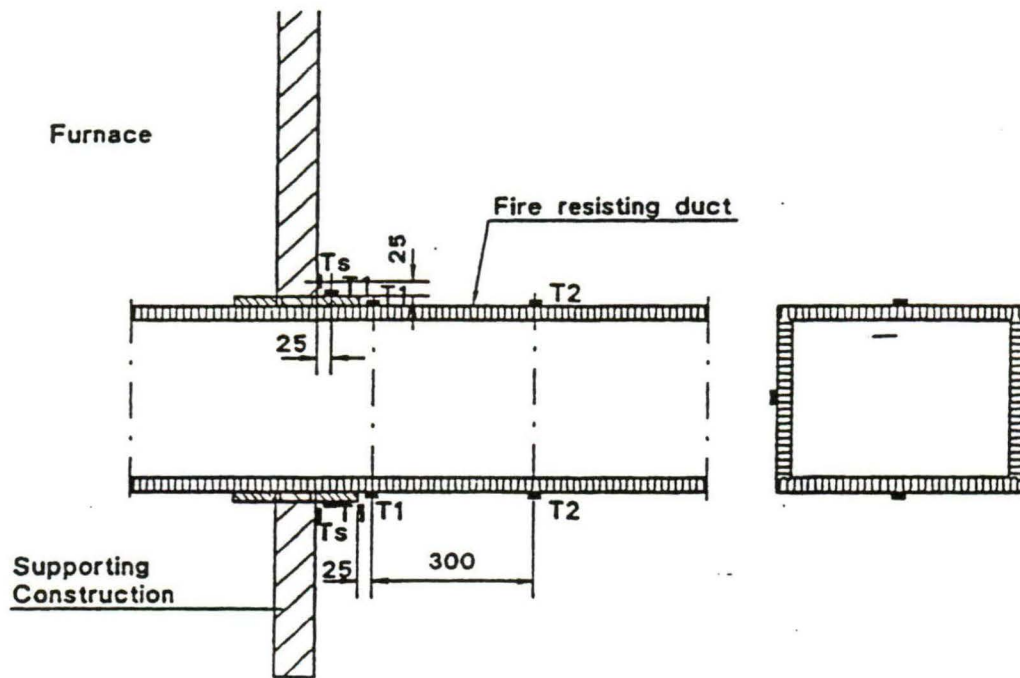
Arrangement of furnace thermocouples in case of horizontal ducts
